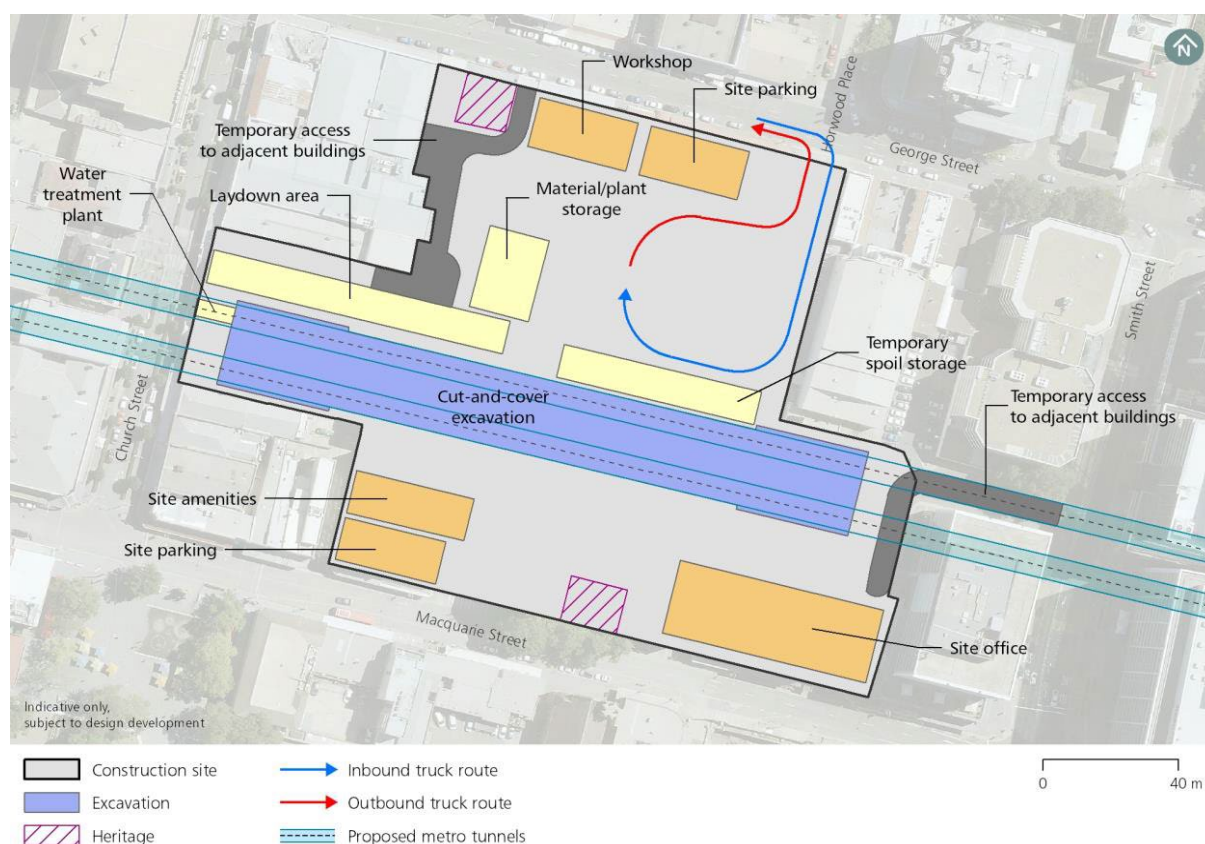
Parramatta metro station construction site with the station box and general site layout for the Stage 1 works. (Source: Artefact 2019, Figure 3)
